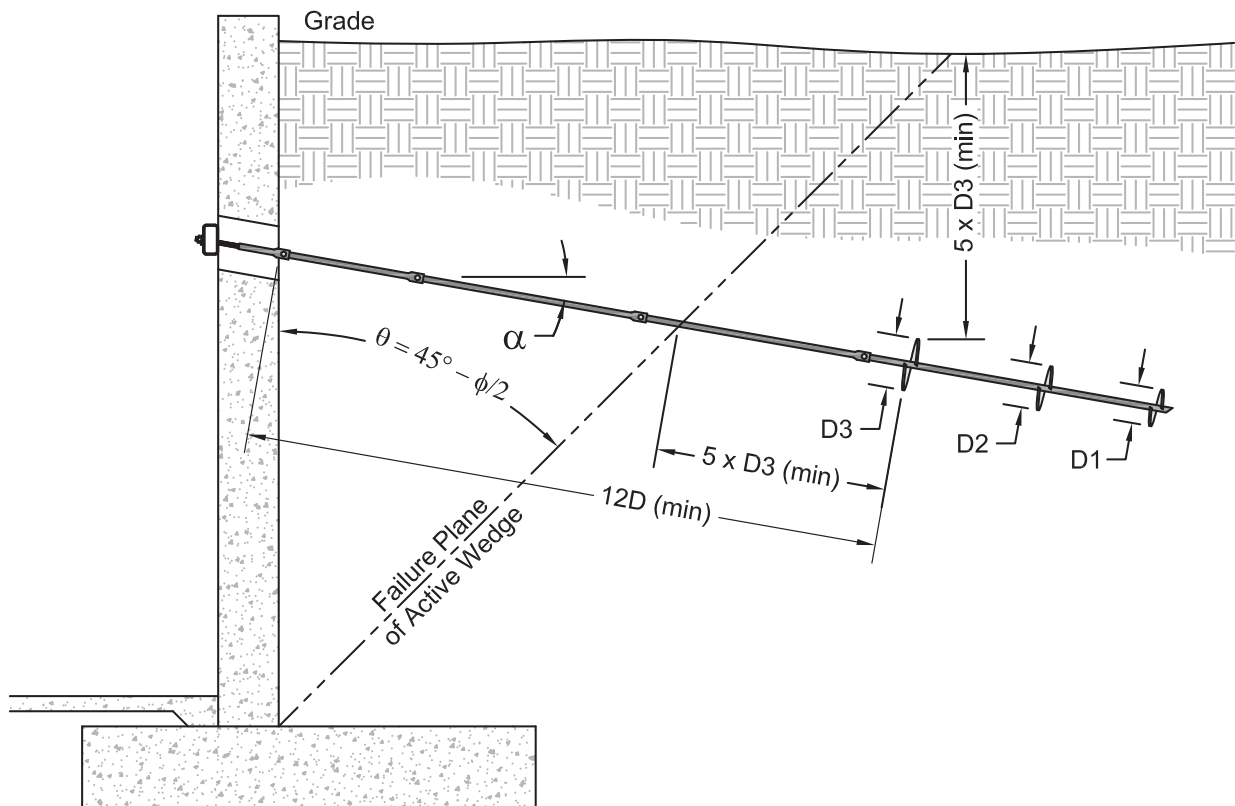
Helical tiebacks and tube steel walers stabilize concrete retaining wall
